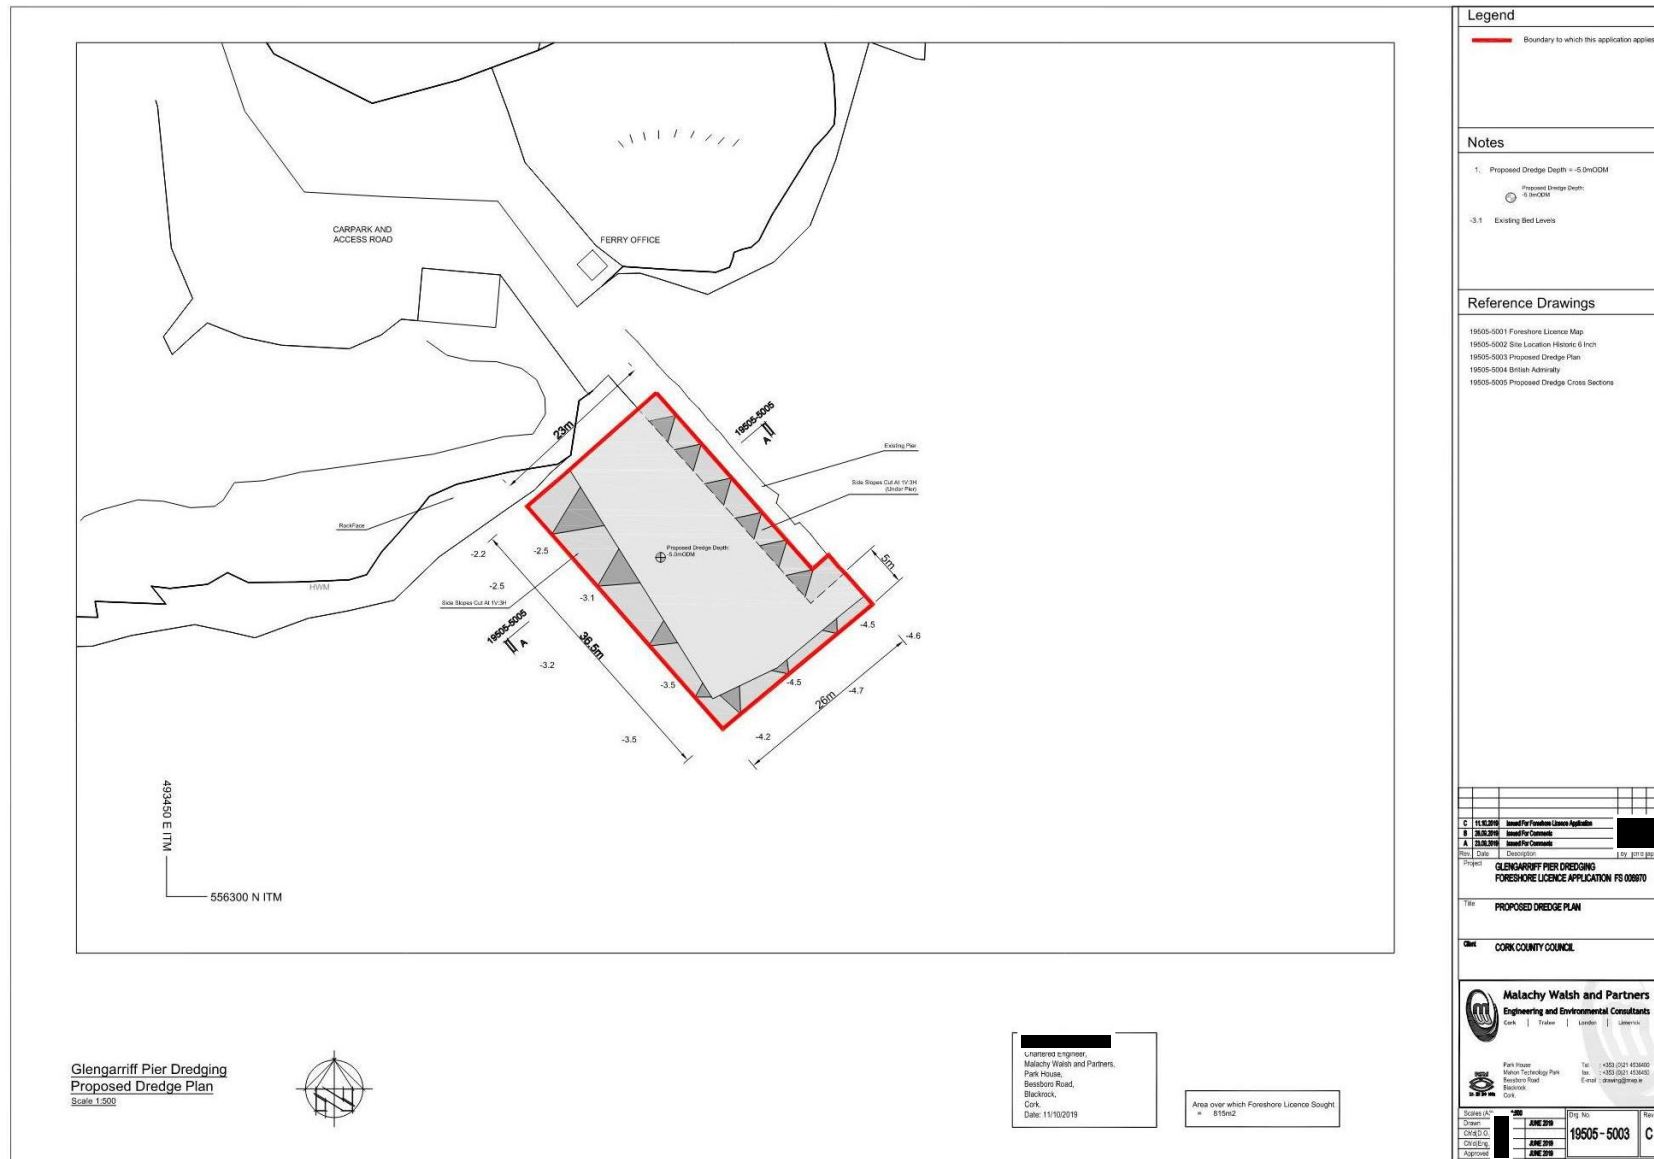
Glengarriff Pier Dredging Project Site Boundary
